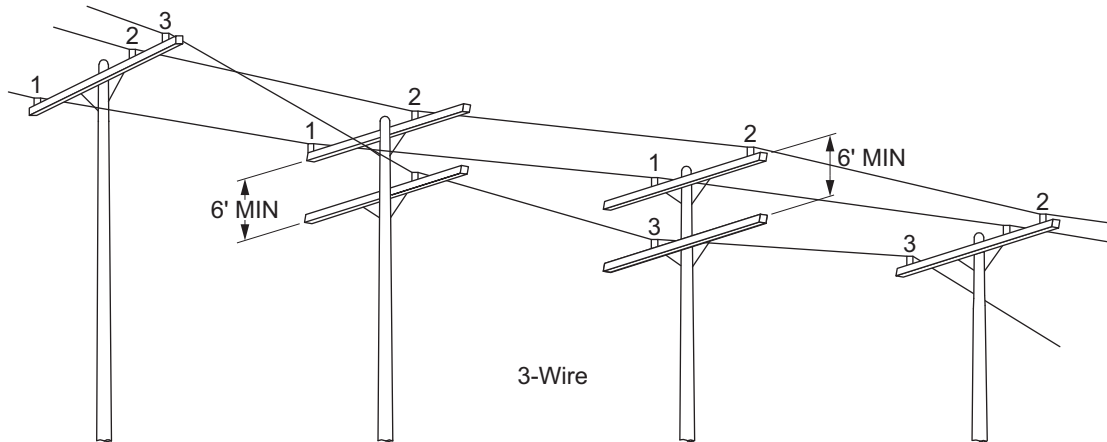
3- and 4-Wire Transposition Construction
